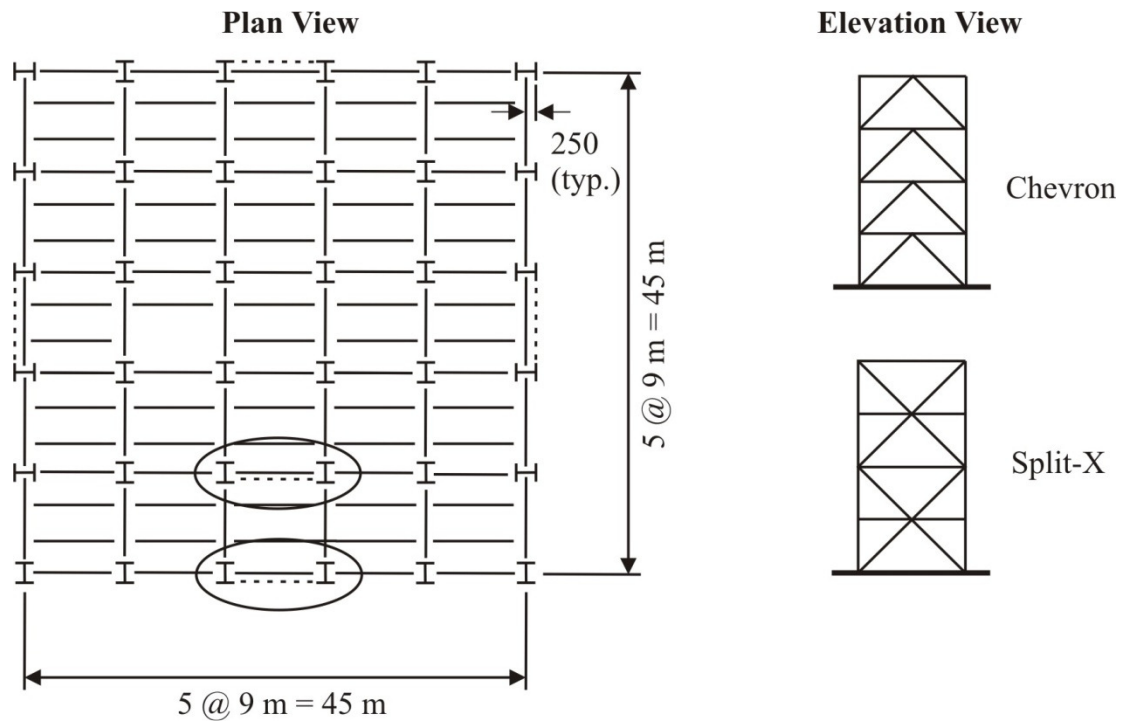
Plan layout of the structures showing the location of both exterior and interior bracing location.
